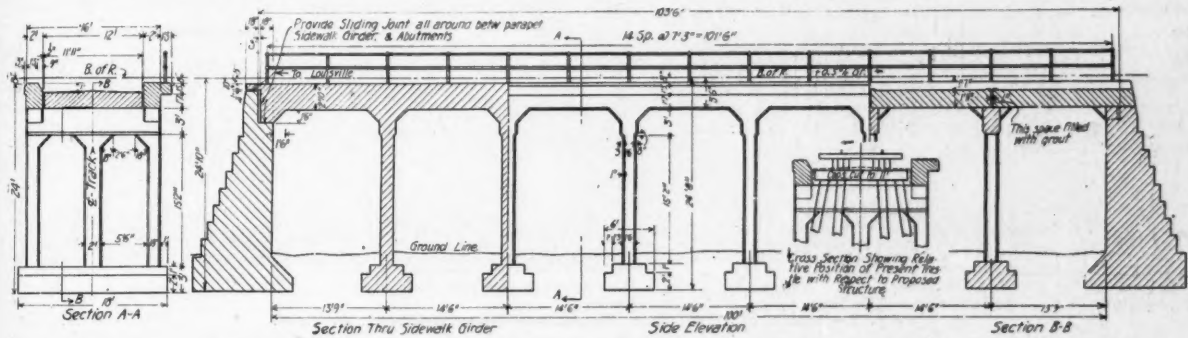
General Design Concrete Trestle—Cumberland River Bridge, I. C. R. R.
